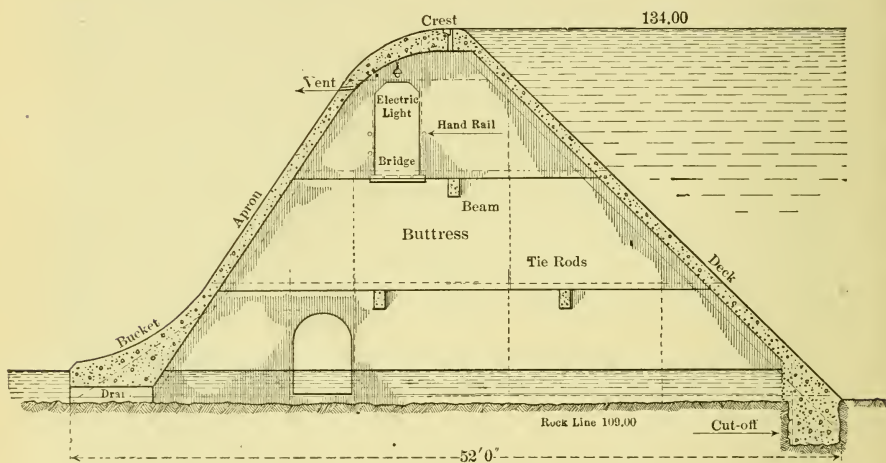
SECTION OF HOLLOW CONCRETE-STEEL DAM.
